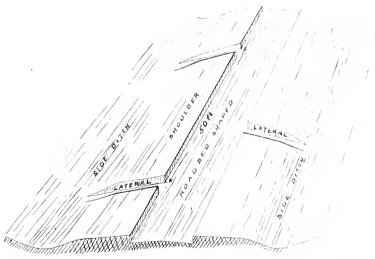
Sketch illustrating position of lateral drains, which should be cut as soon as roadbed is shaped so as to drain water from the roadbed to the side ditches.
